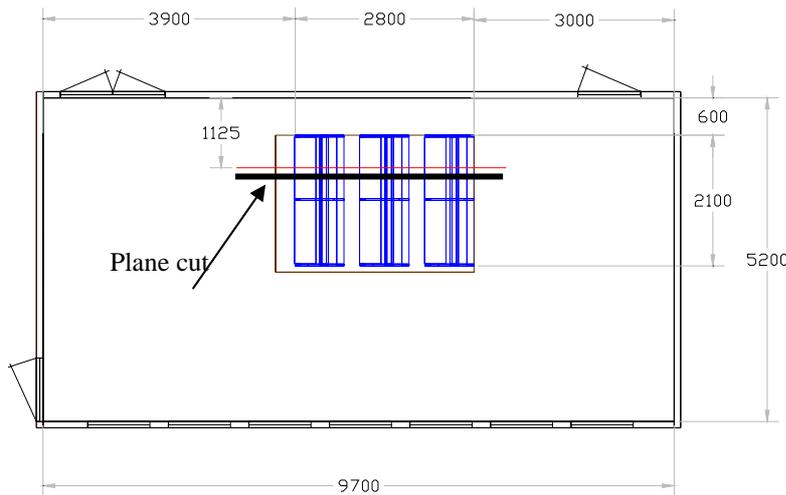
Overview dimensions (mm) of climate room, benches and plane cut.
